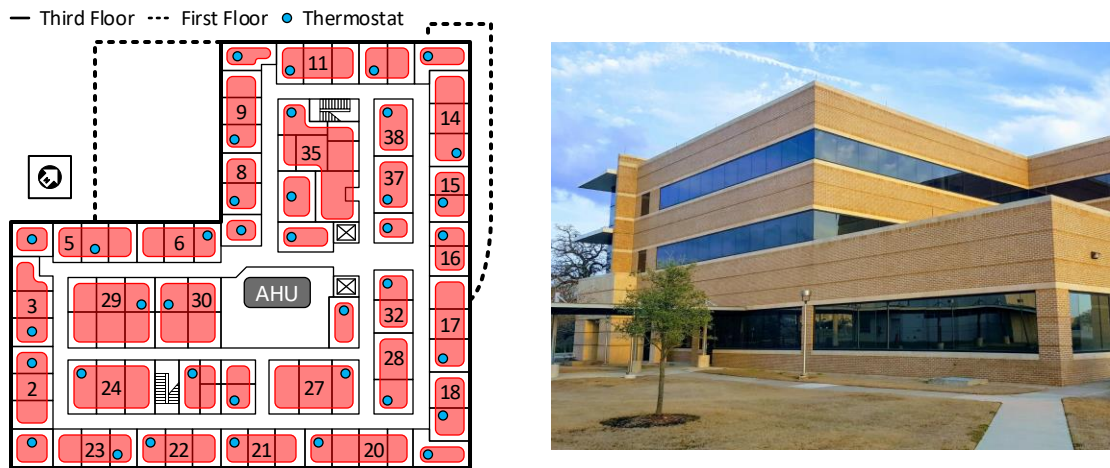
Basic layout of HVAC zones and exterior of the TTI Building.
